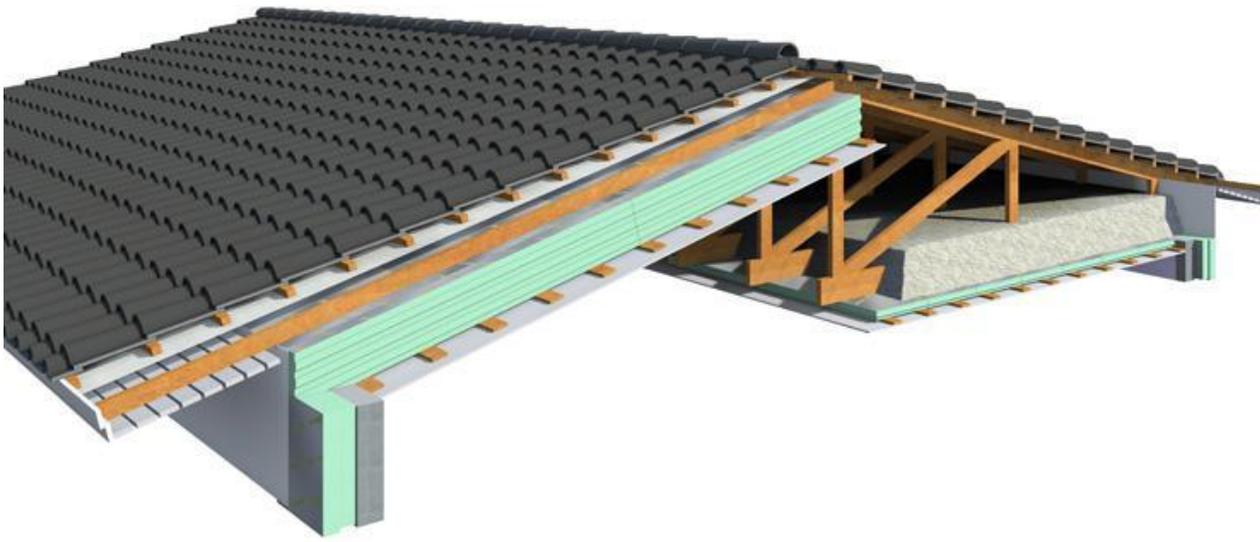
Thermal insulation of the roof. When installing a pitched roof or frame wall, wool is inserted between the rafters. In such a construction it is necessary to install a vapor barrier layer from the inside. By using a single layer of FF-PIR insulation from the inside, it is possible not only to form a tight and reliable vapor barrier, but also to provide additional insulation to the structure.
